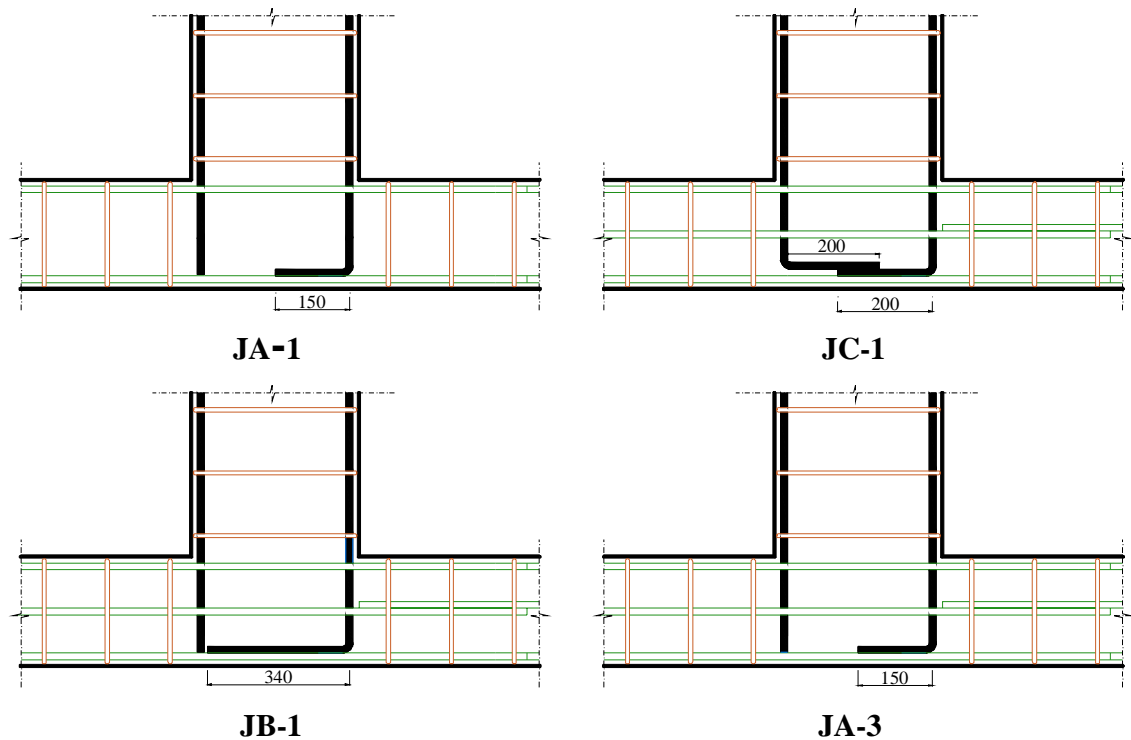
Anchoring details of beam longitudinal reinforcement in the joint area
